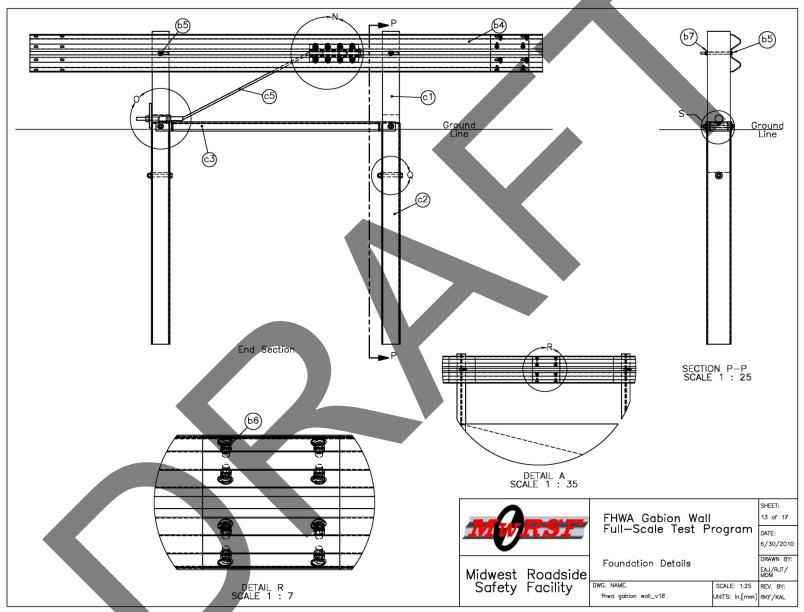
Schematic. Foundation Details, Test Nos. MGSGW-1 and MGSGW-2.
